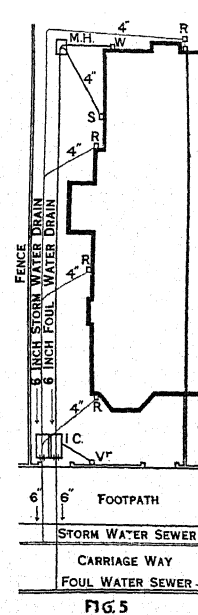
SEPARATE SYSTEM OF HOUSE DRAINAGE
